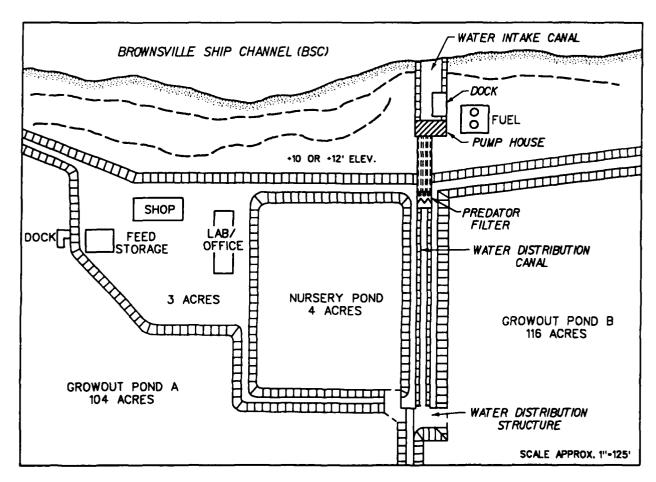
CAAP Shrimp Farm Demonstration Site Infrastructure Layout
